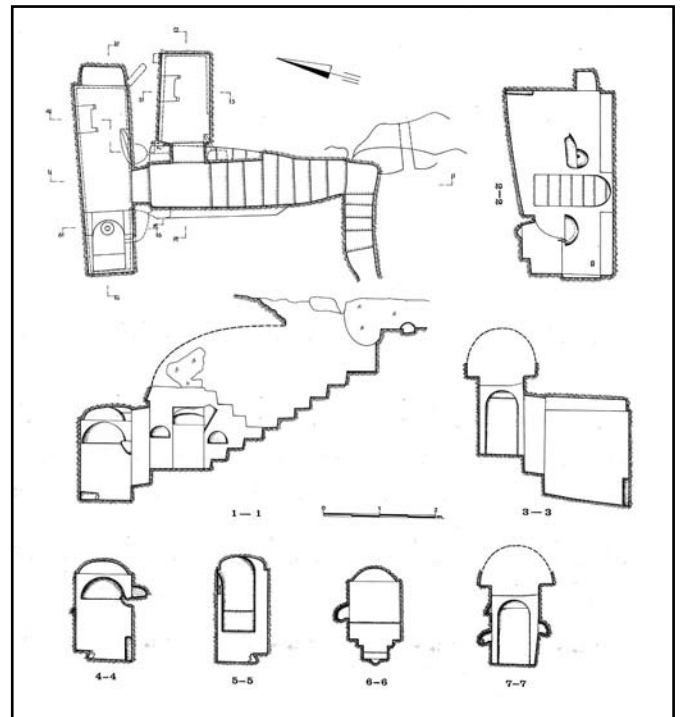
Plan and sections of bath - SC 82 (Kloner, IAA).
